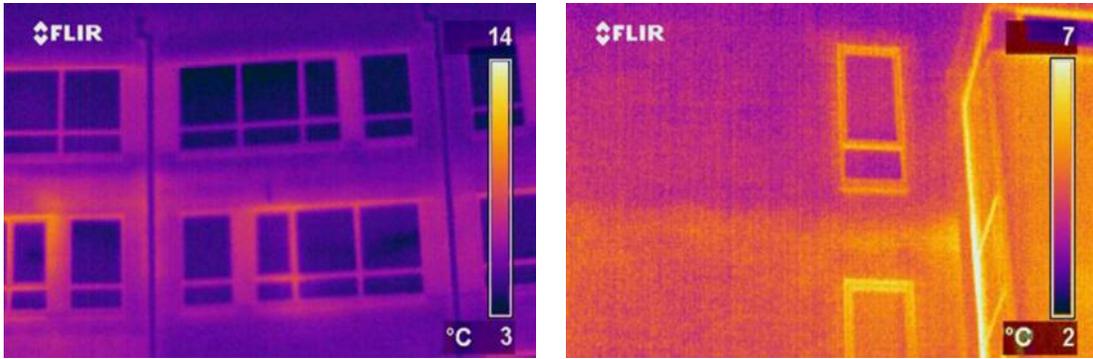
Building A thermography: reasonably continuous insulation across external walls with some shortcomings around the windows (left); thermal bridge at the junction between cavity wall and the curtain wall system (right)
